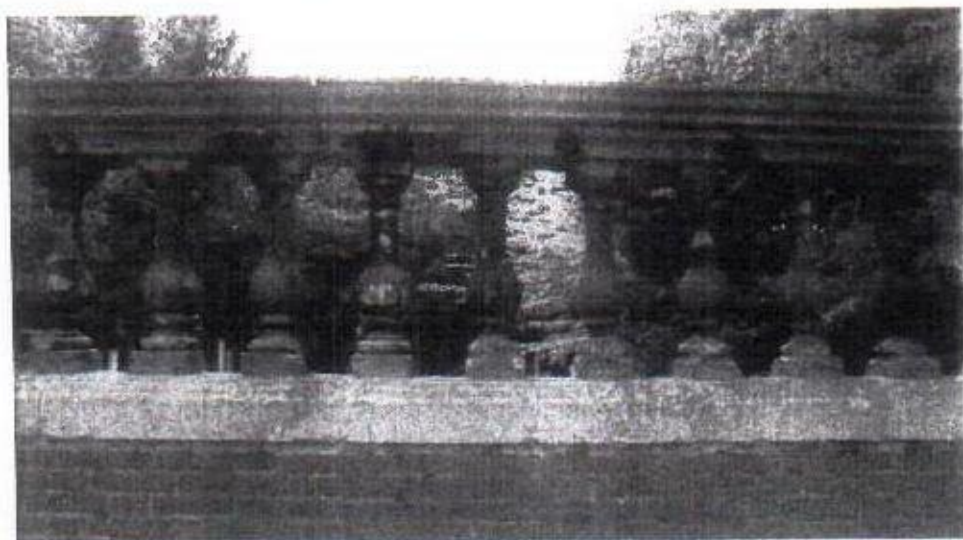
ITALIAN TERRACE GARDEN BOTTOM HEAD WALL 25
